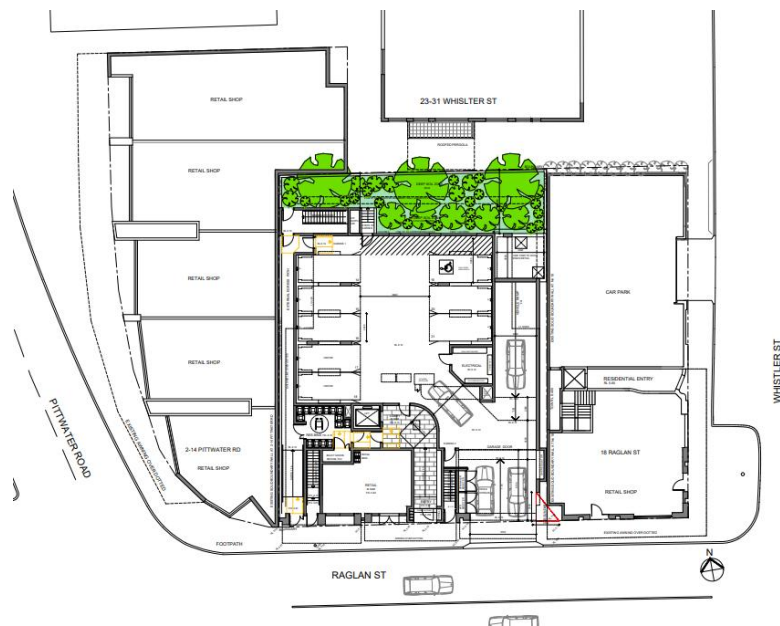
Ground Floor Plan - (Source: Carlisle Architects)
